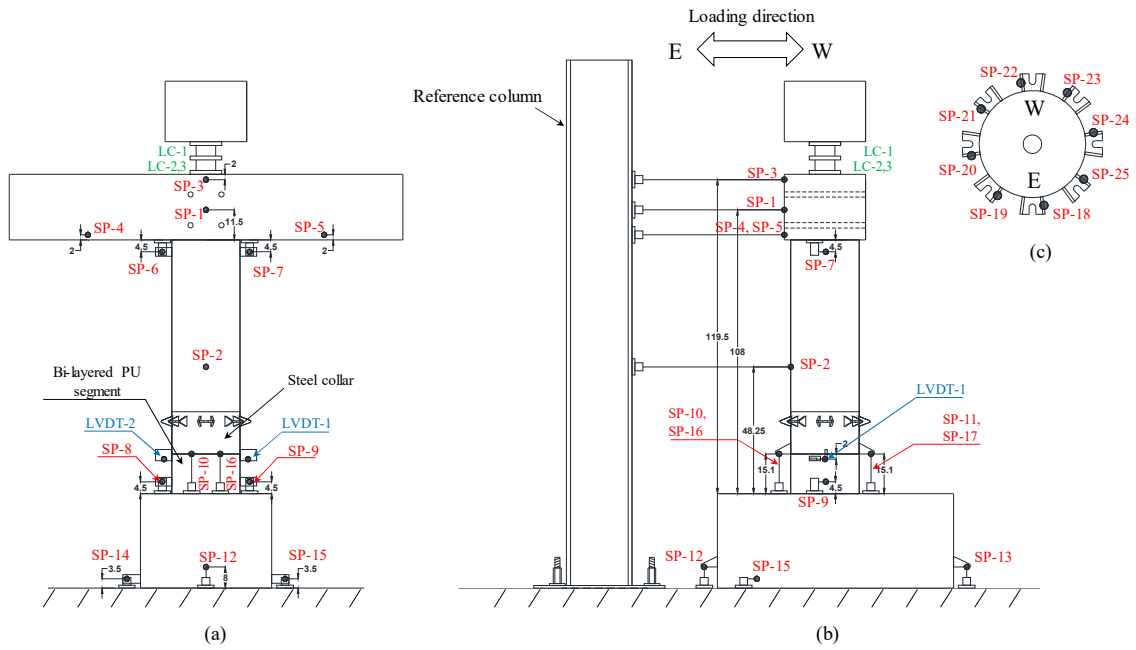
Schematic representation of instrumentation for PUED rocking specimen: (a) south-north elevation (looking west); (b) east-west elevation (looking south); (c) ED link elongation string potentiometers (Note: ED links not shown).
